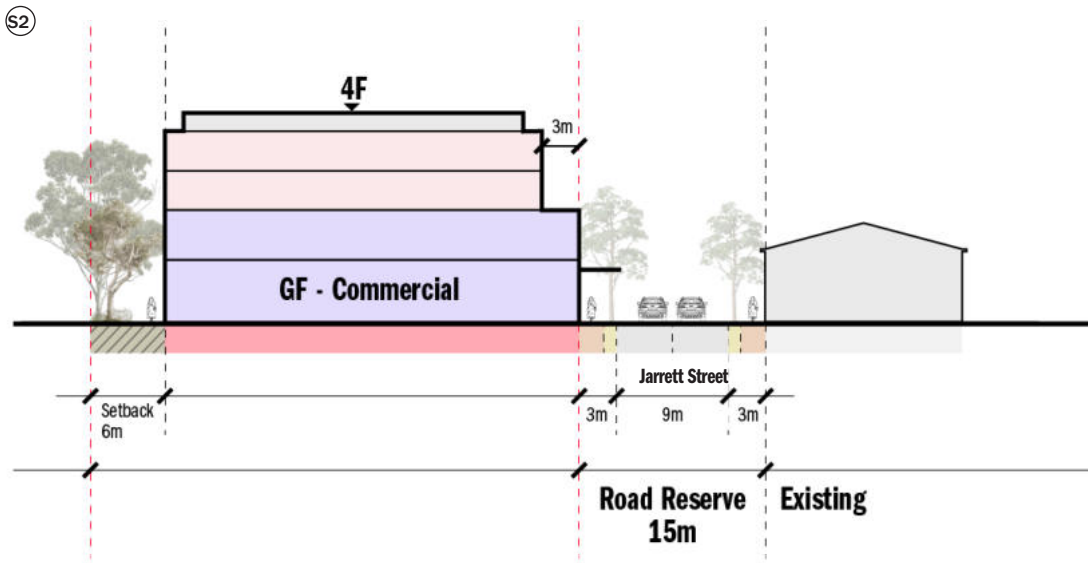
Section 2 - cross section through Jarrett Street showing relationship to existing built form
